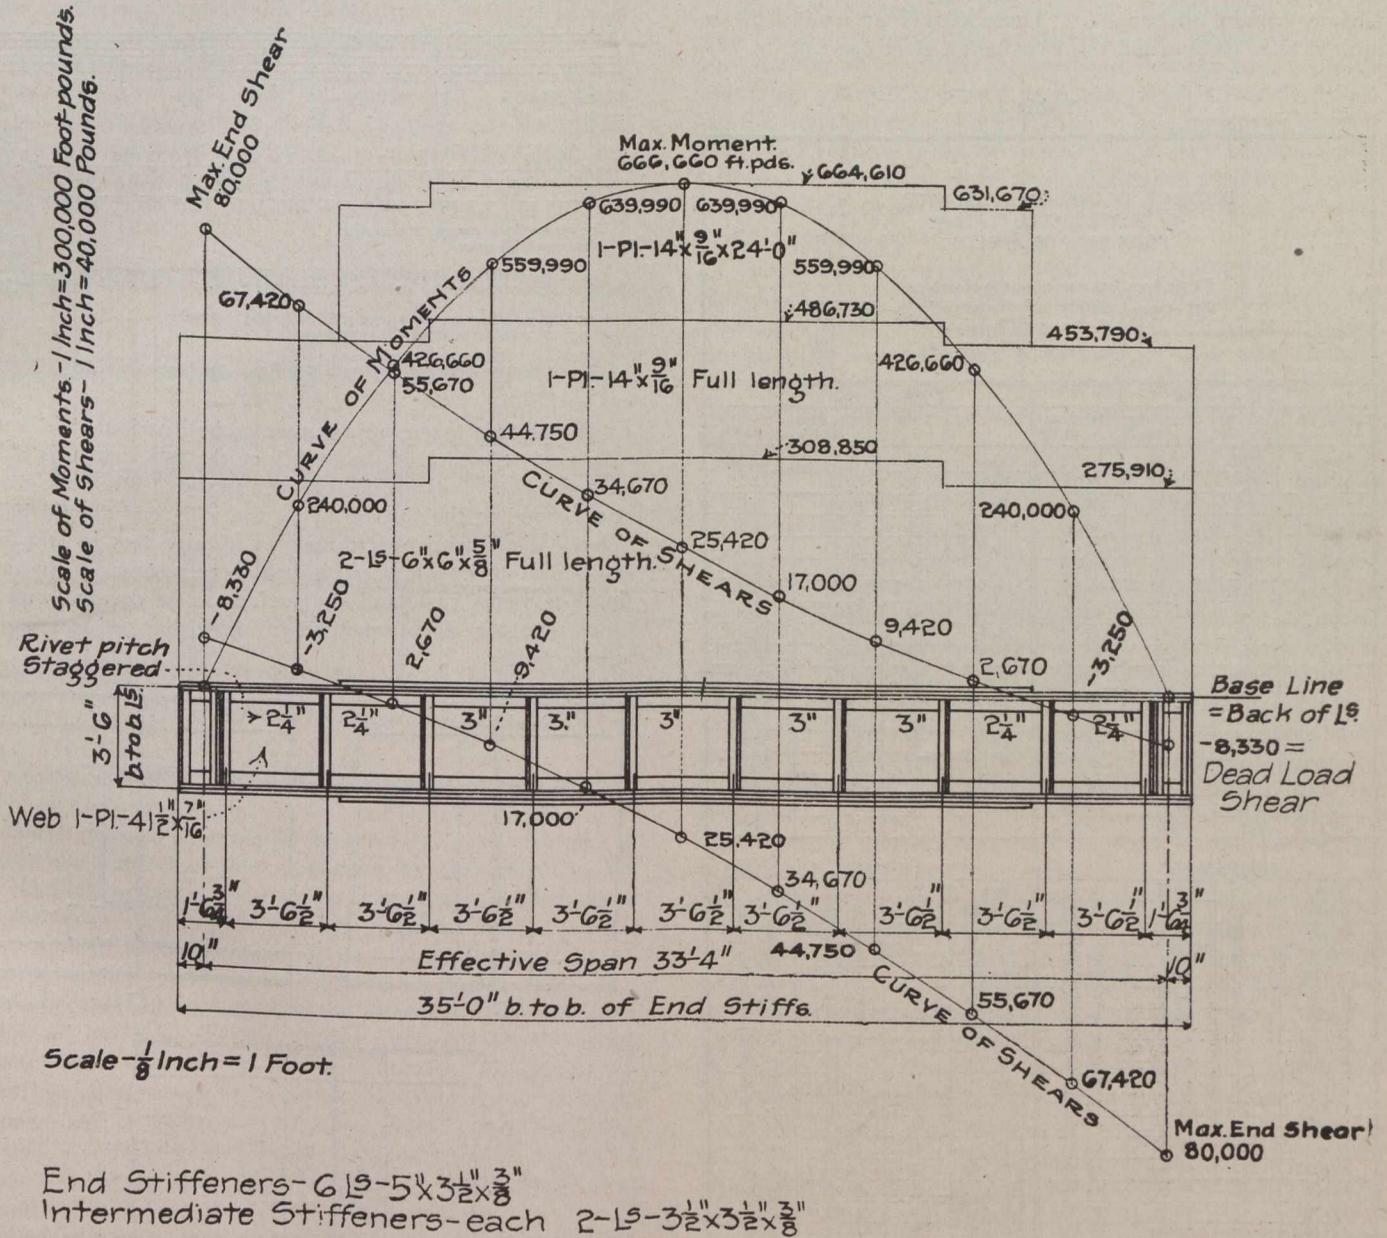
Stress and Section Diagram for Deck Plate Girder.
